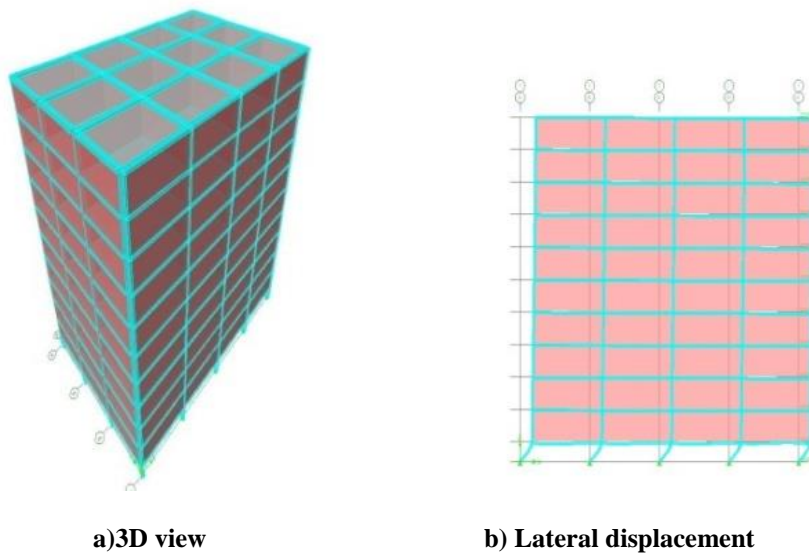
Model 4: G+10 RC first soft storey building with slab element
